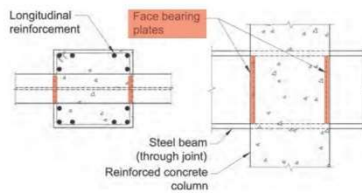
Reinforced concrete column-to-steel beam moment connection.
